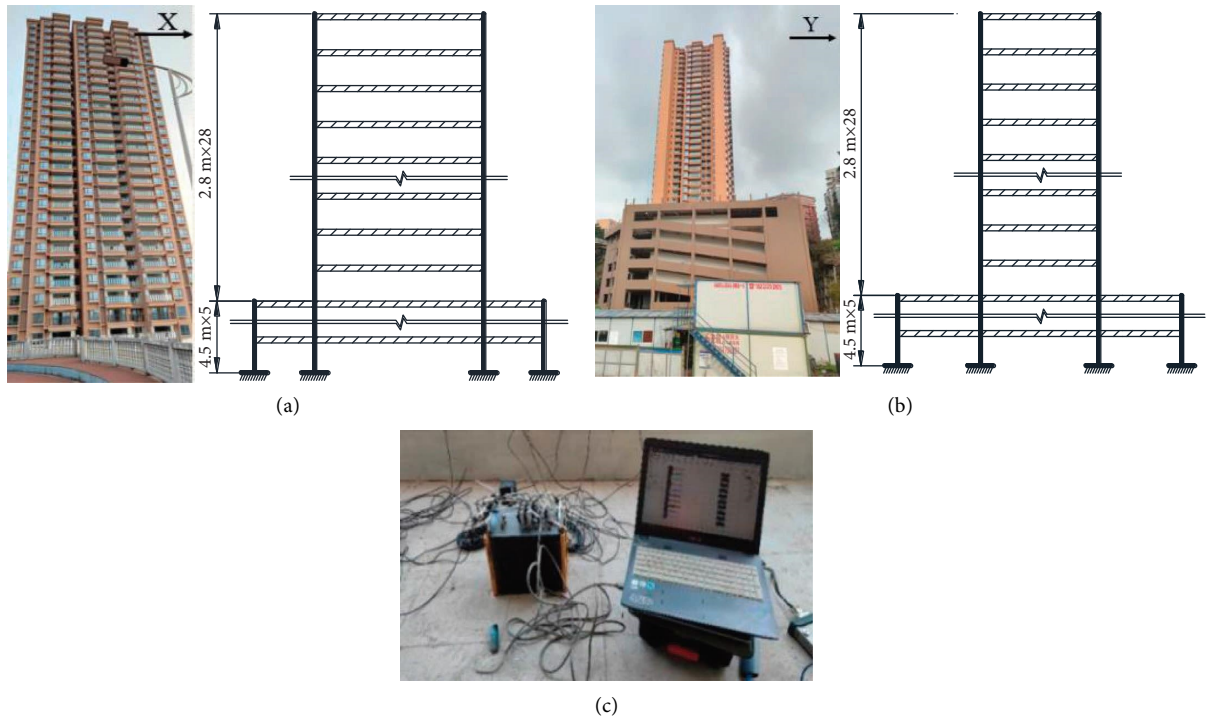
Photograph of high-rise building and test equipment: (a) front elevation; (b) side elevation; (c) test equipment.
